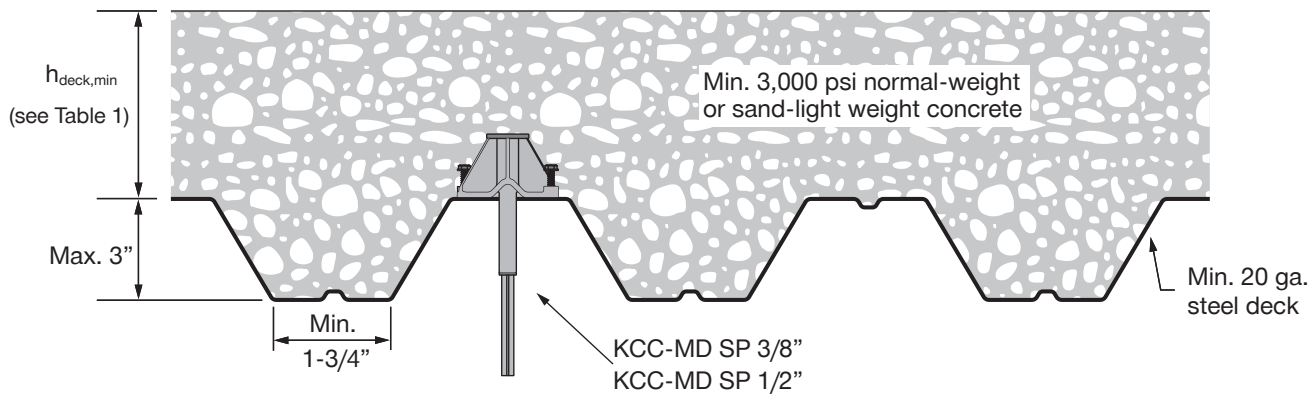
A — Installation of KCC-MD inserts in the soffit of concrete filled metal deck floor and roof assemblies-over upper flute (B-deck and W-deck)
